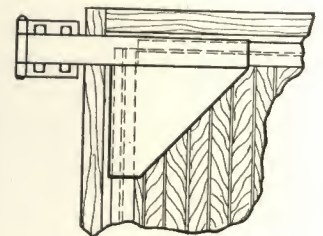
Elevation showing hinge attached to upper corner of door
